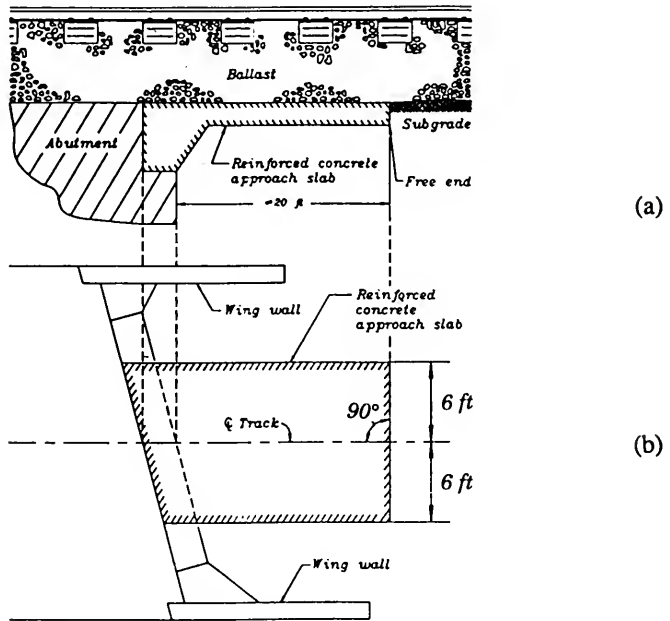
Transition at Bridge Abutment Utilizing a Reinforced Concrete Approach Slab.
